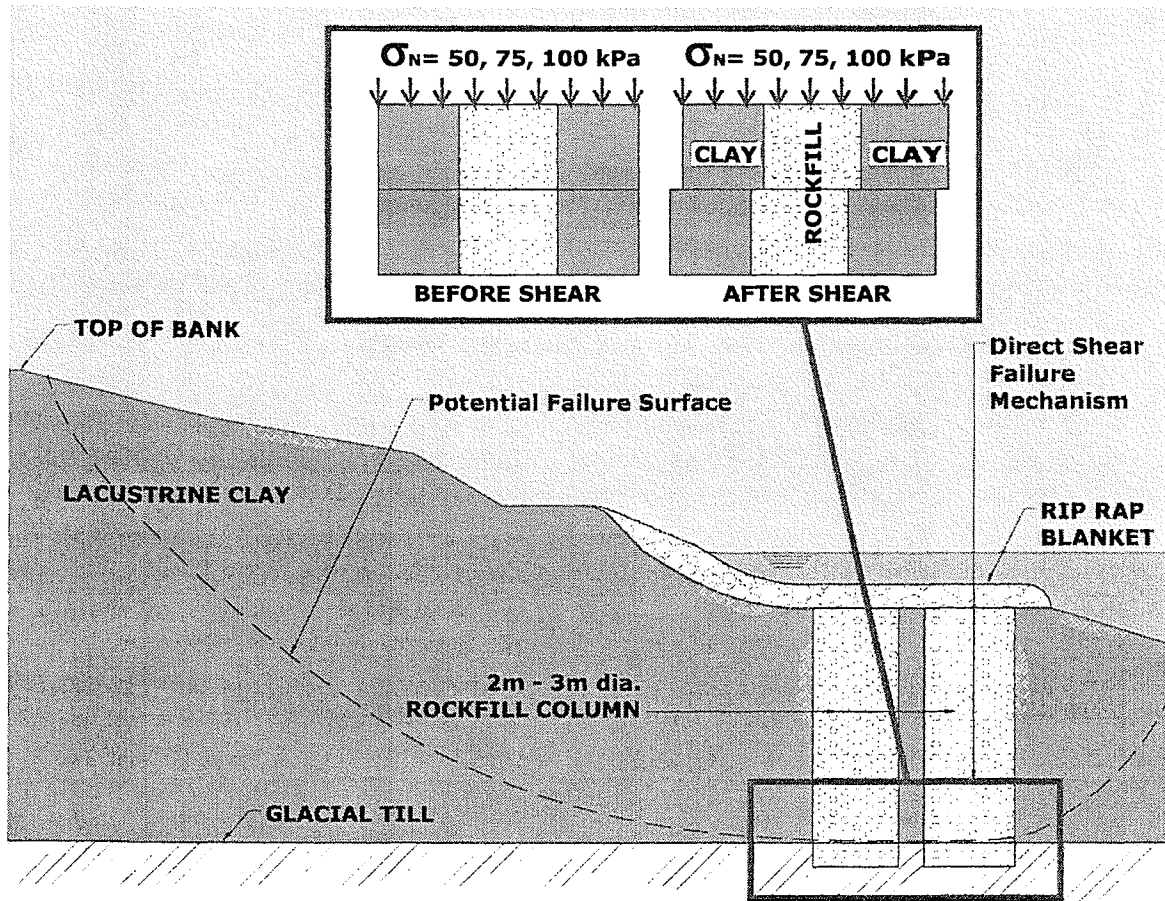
Typical riverbank cross-section stabilized with rockfill columns (after City of Winnipeg 2000)
